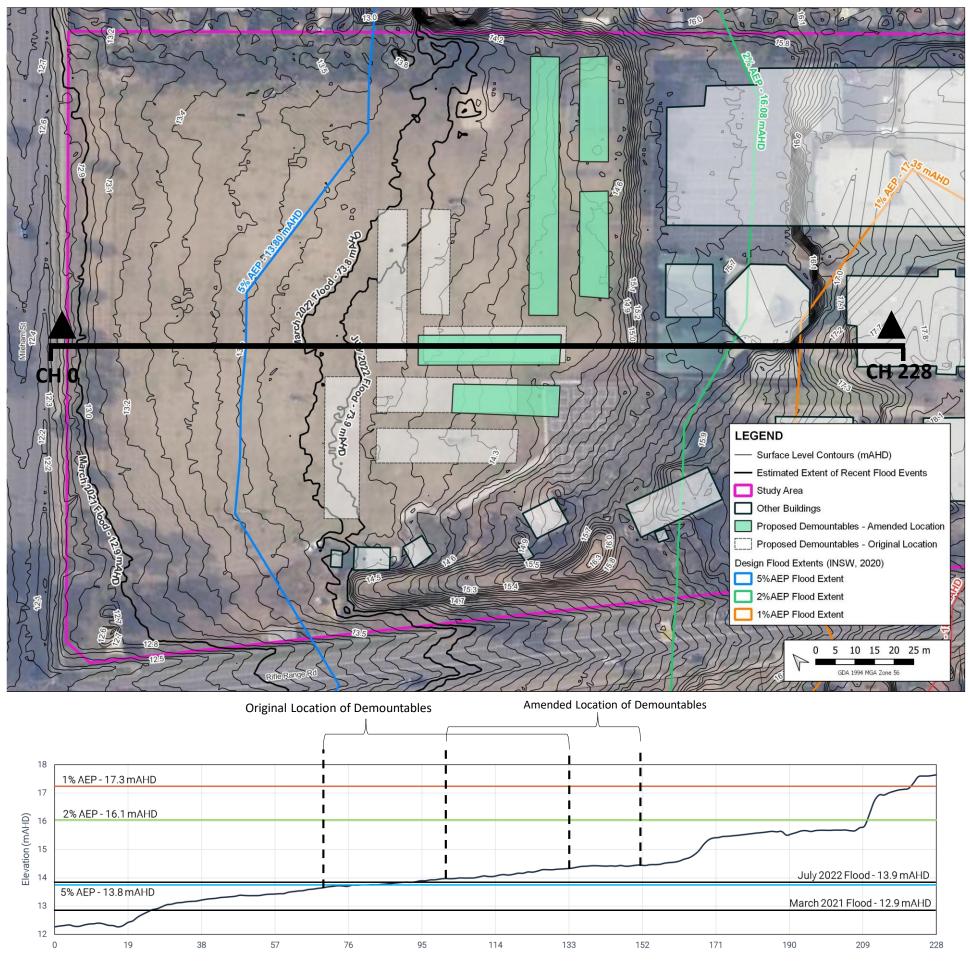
Proposed Demountable Buildings Location and Flood Extents
